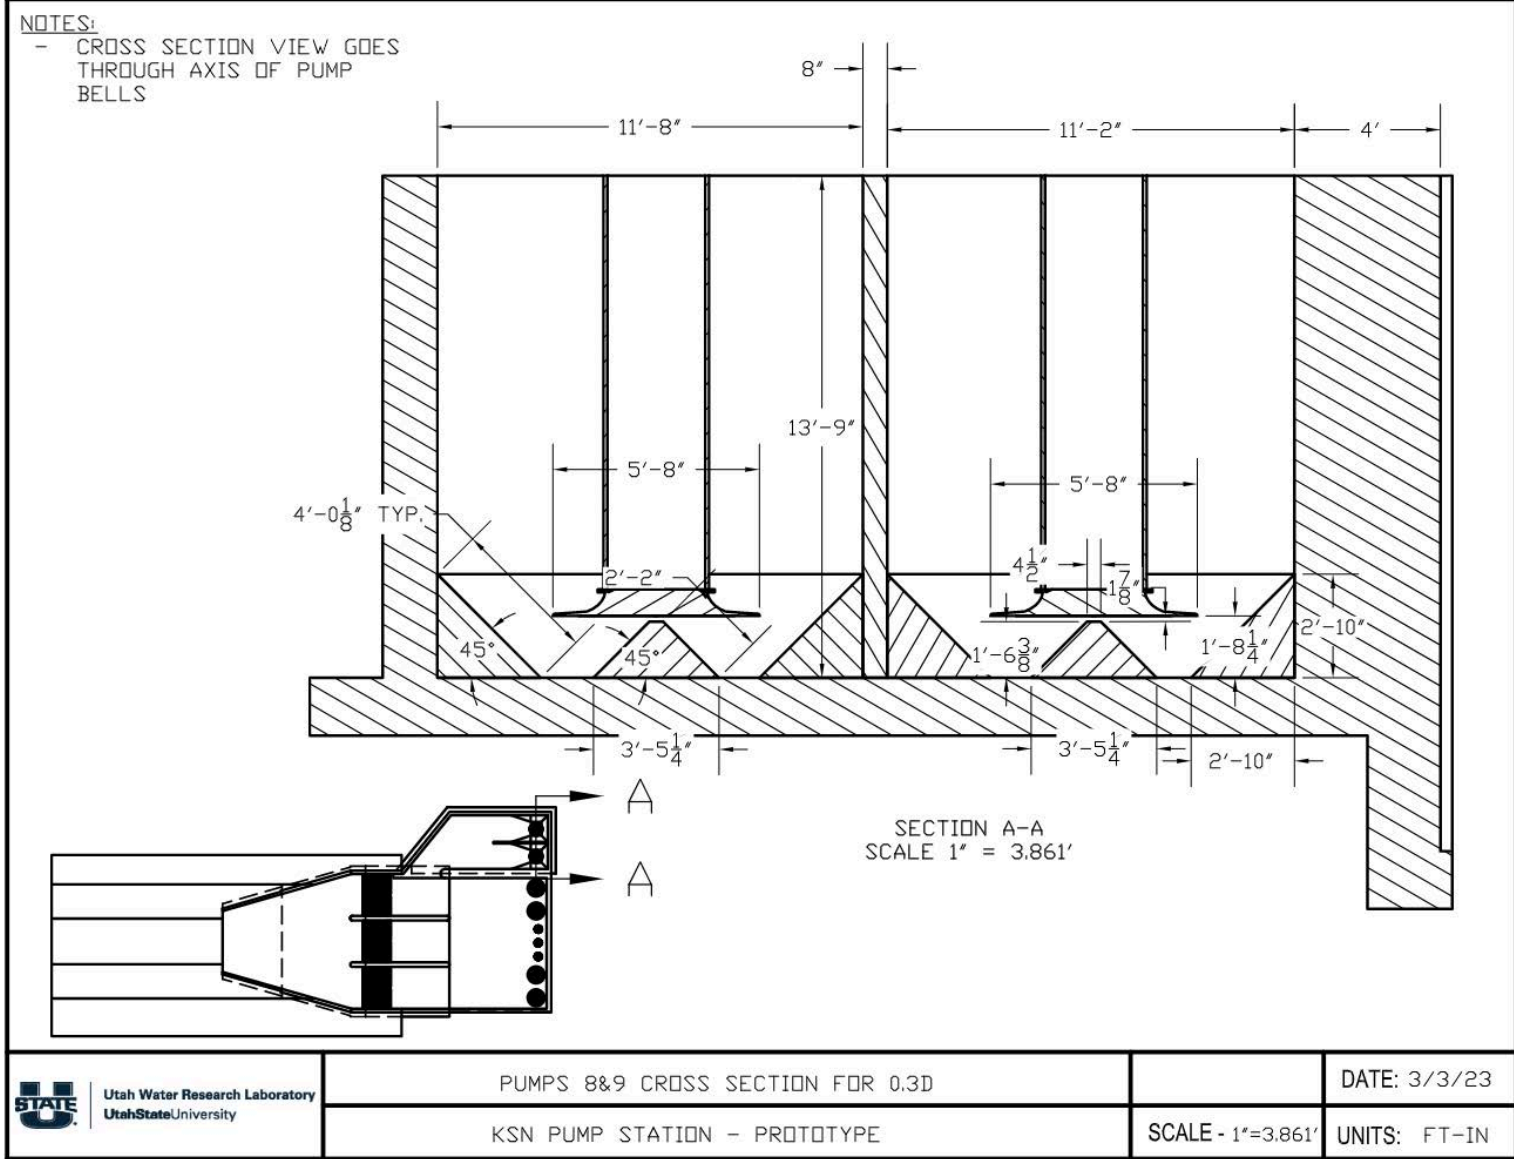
Final fix for pumps 8 and 9 (end view prototype dimensions)
